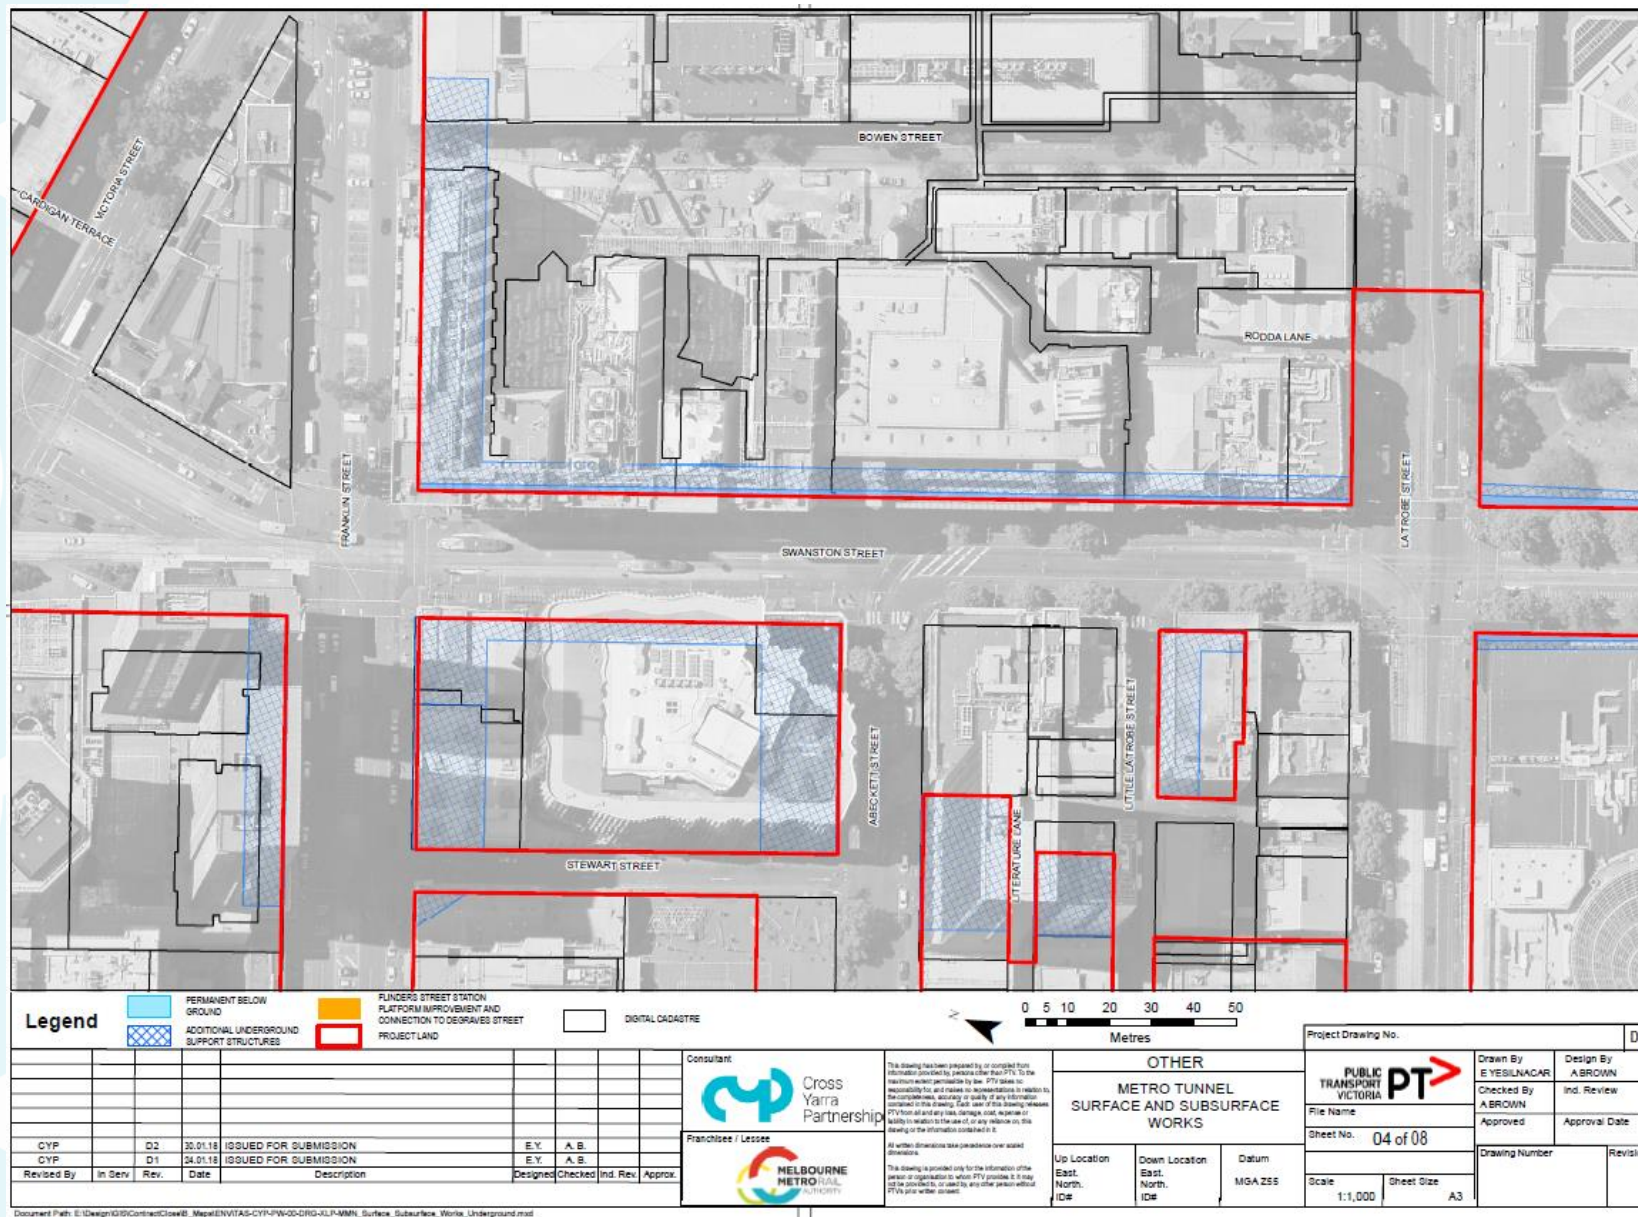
ADDITIONAL PROJECT LAND REQUIRED FOR UNDERGROUND SUPPORT STRUCTURES AND PERMANENT BELOW GROUND AT CBD NORTH STATION
